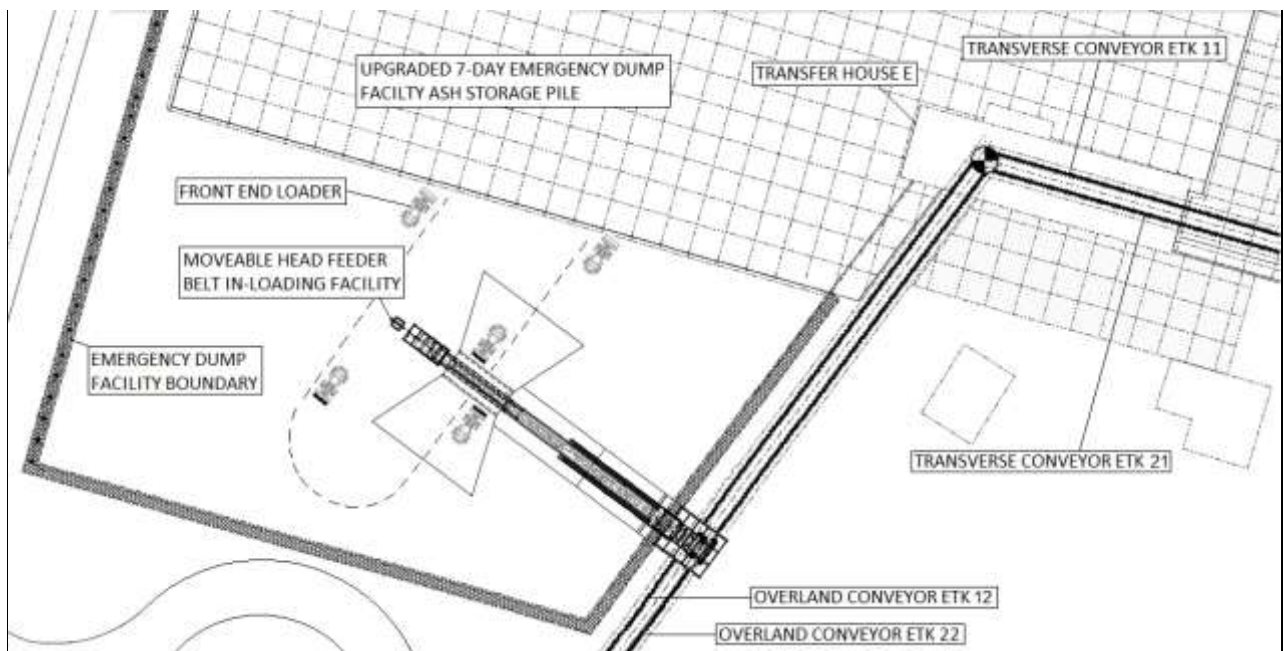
General Layout of In-loading Feeder Belt on the Upgraded E-Dump
